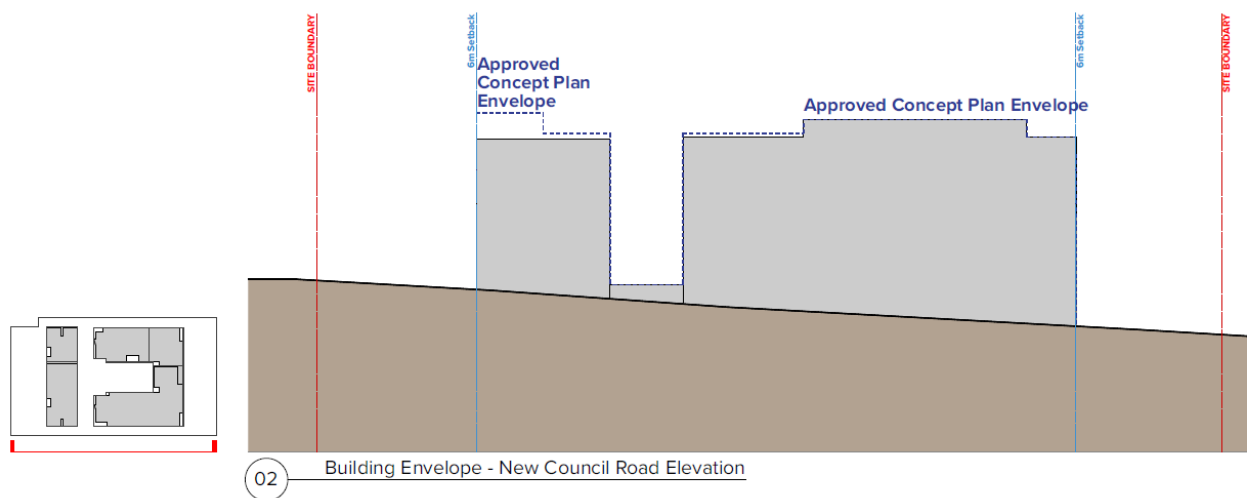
Extract from the Building Envelope Diagram showing the proposed Buildings D.1 and D.2 (shown in grey) are consistent with the building envelopes and 31 metres building height approved in the Stage 1 Concept Plan (JRPP-15-01543 as amended) (shown in blue).
